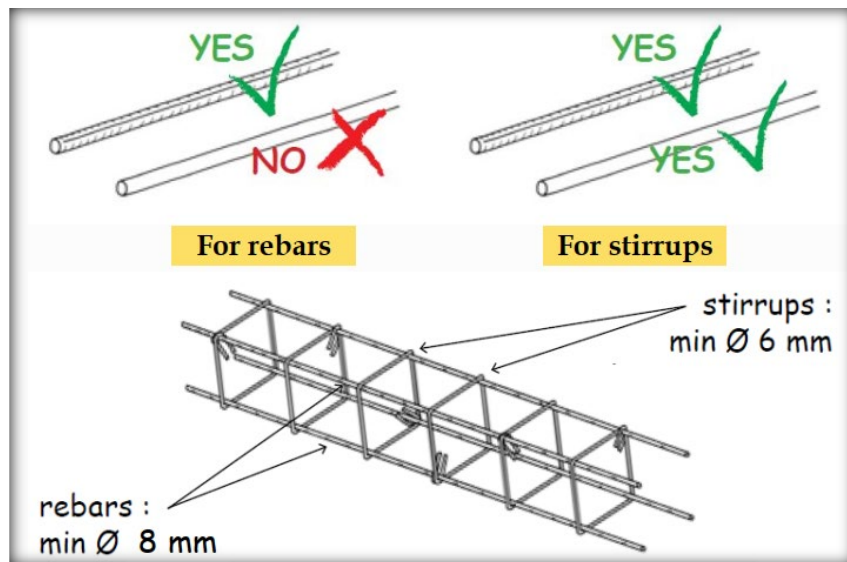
Construction of Reinforced Concrete Tie-column- Rebars
